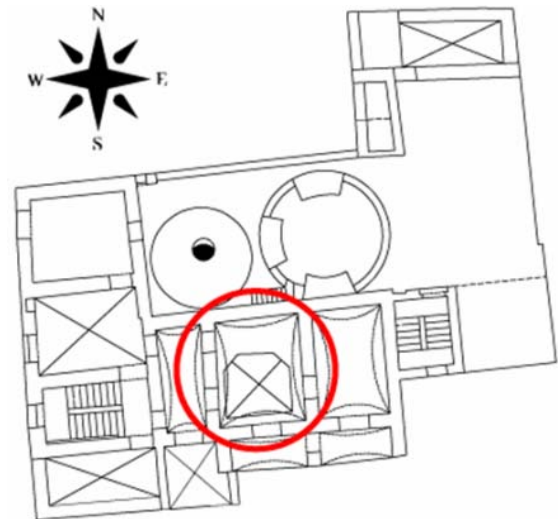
Planimetric position of the rebuilt vault in the Rione Terra.
